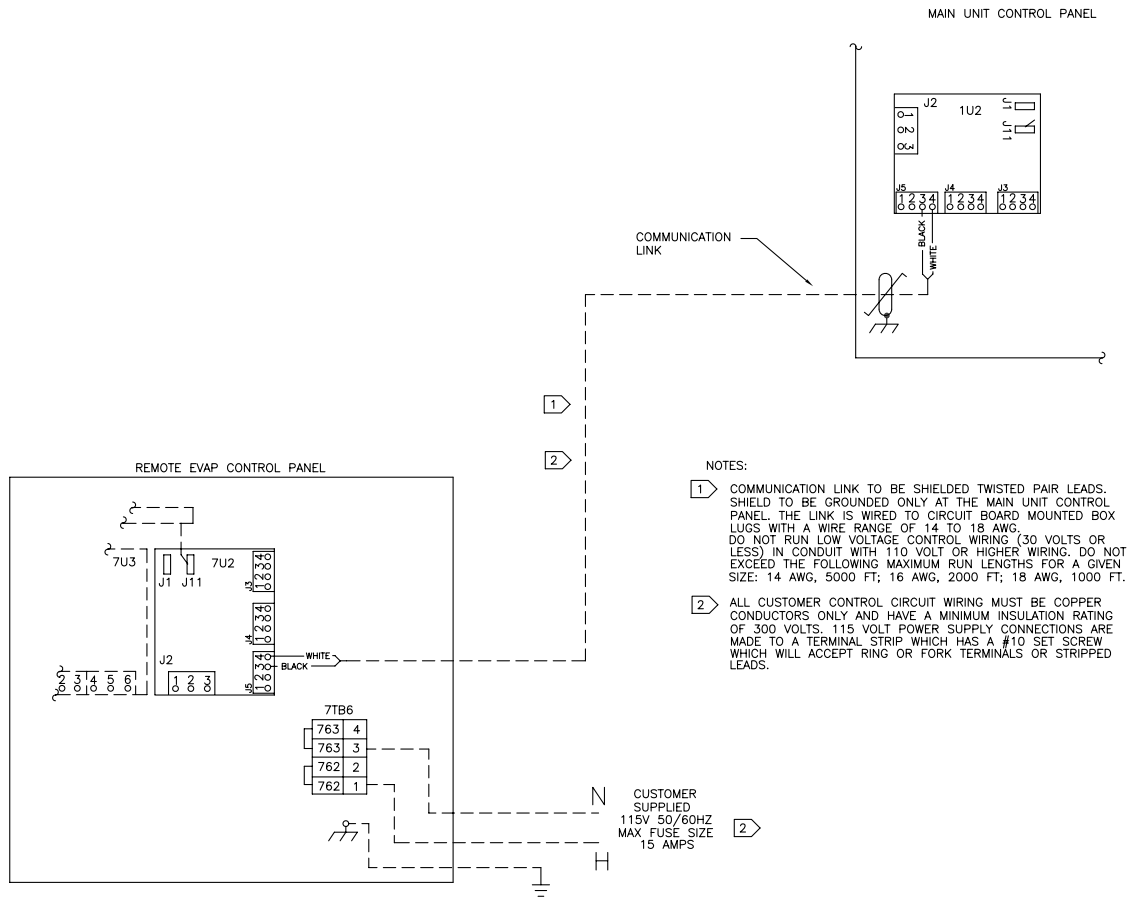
Field Wiring between Remote Evaporator and Condensing Unit
